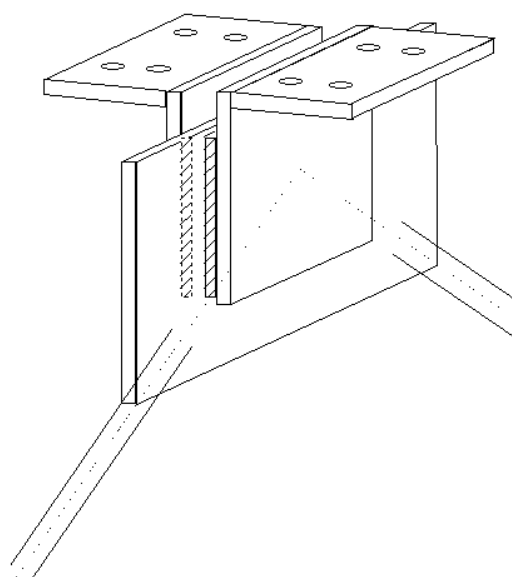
Details of the attachment of the VE devices to the mock-up structure.
